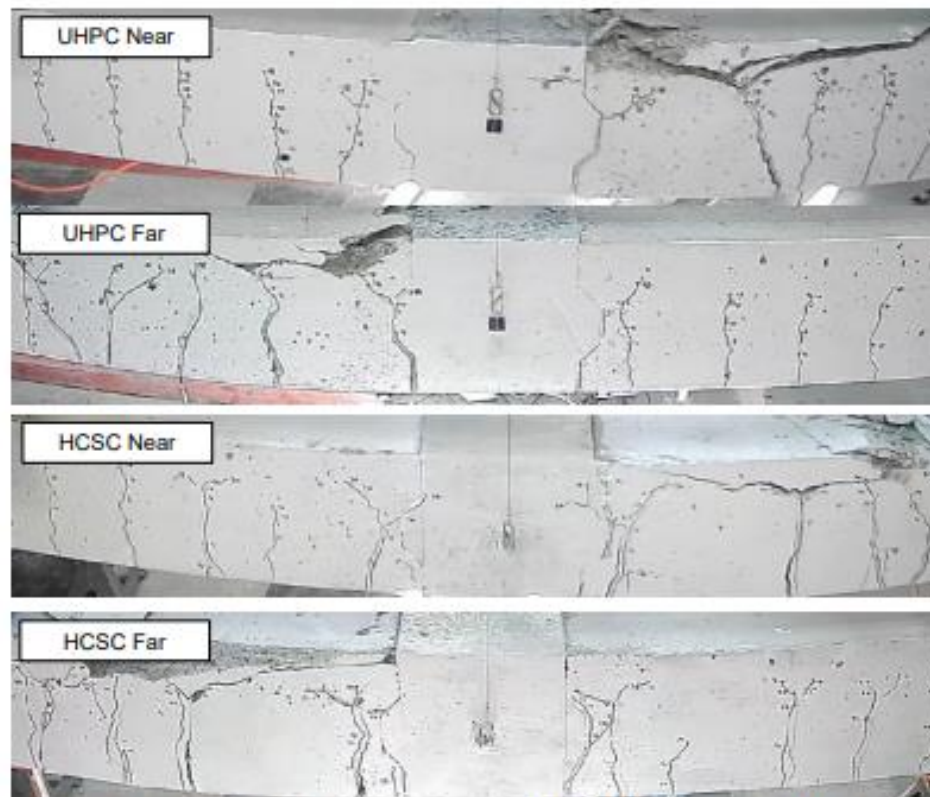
Elevation View of Cracking of D/D Panel Assemblages at Ultimate Flexural Capacity
